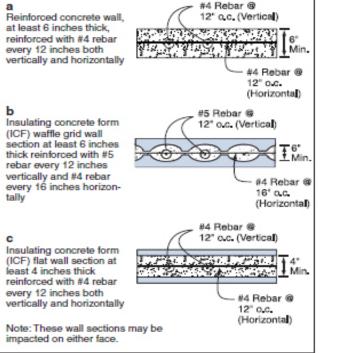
Reinforced concrete wall section (a), reinforced concrete "waffle" wall constructed with insulating concrete forms (b), and reinforced concrete "flat" wall constructed with insulating concrete forms (c)
